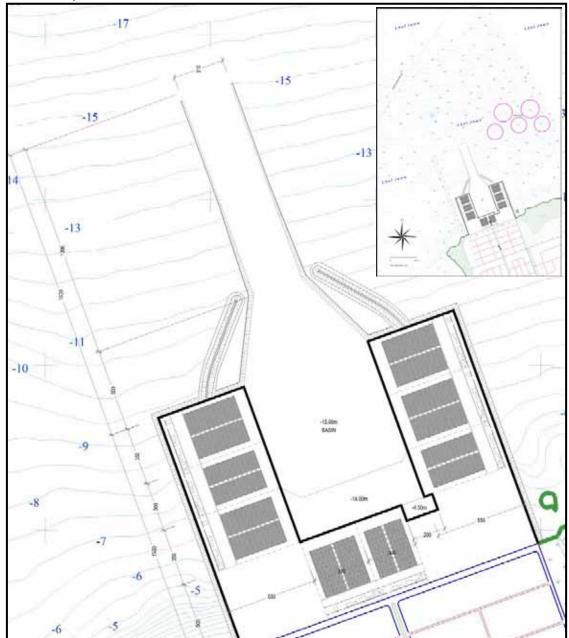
Layout Plan of Tg. Bulupandan Port (below)
